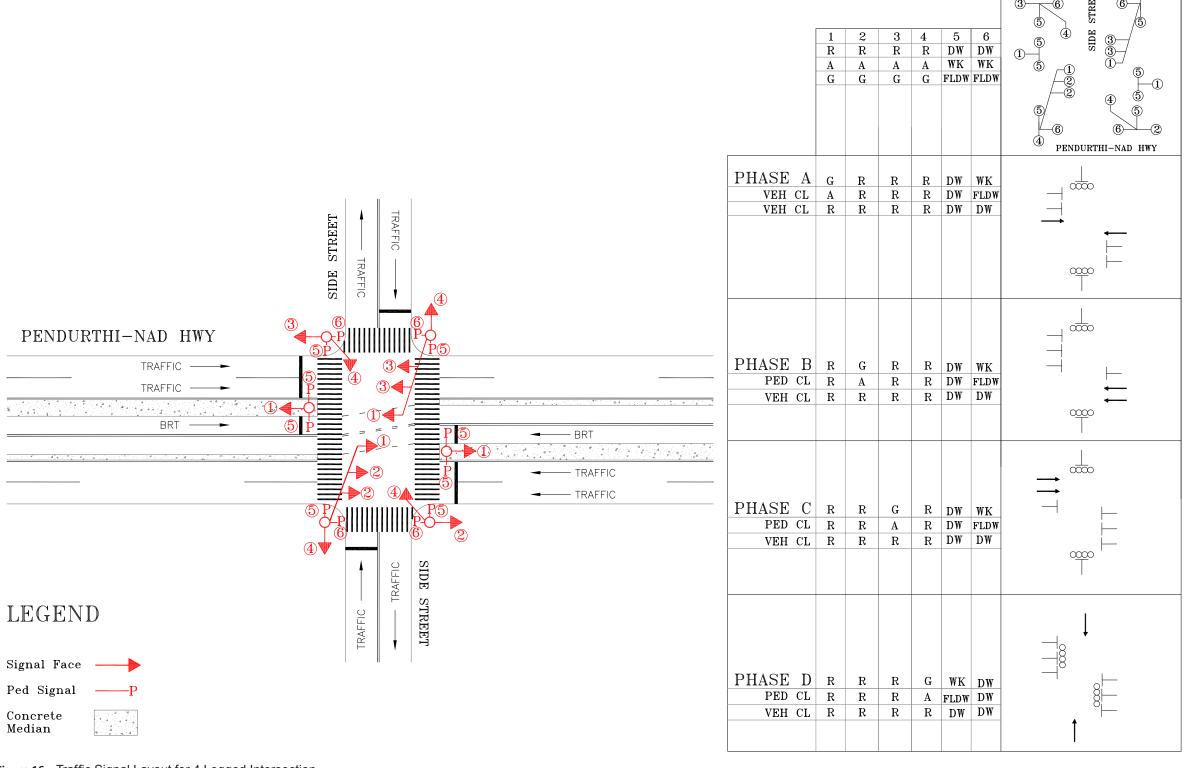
Traffic Signal Layout for 4 Legged Intersection
